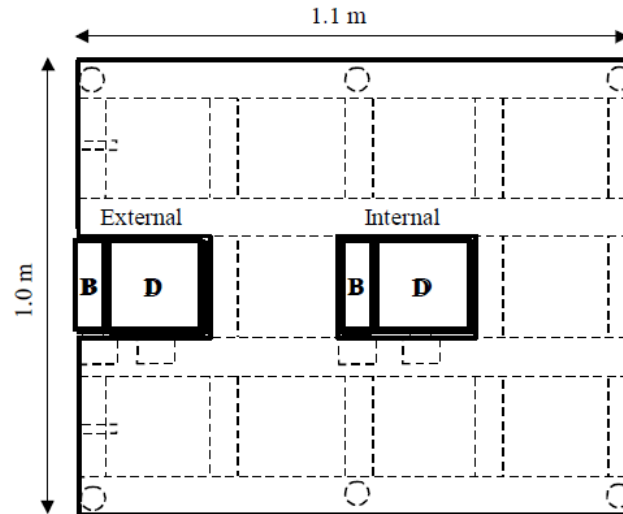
Plan view of model structure. From Tirindelli et al. (2003)
